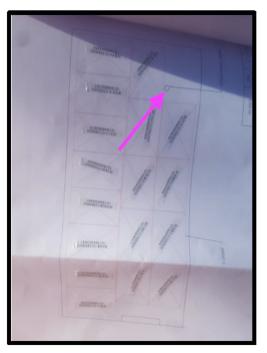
, layout of solar panel array. Arrow points to plumbing vent stack accounted for in layout.
